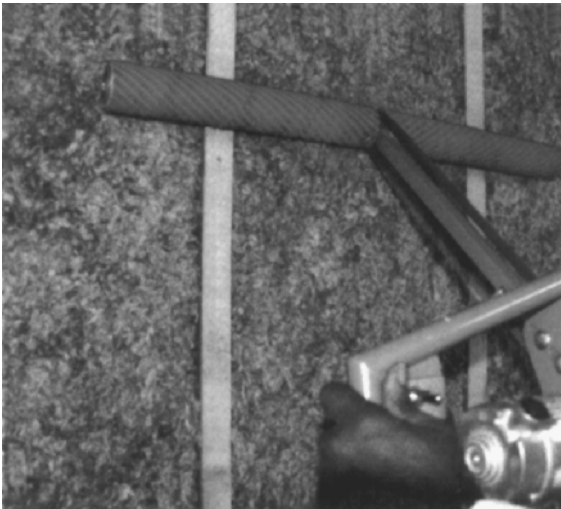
Rock wool wall scrubber. (*American Rockwool*)
